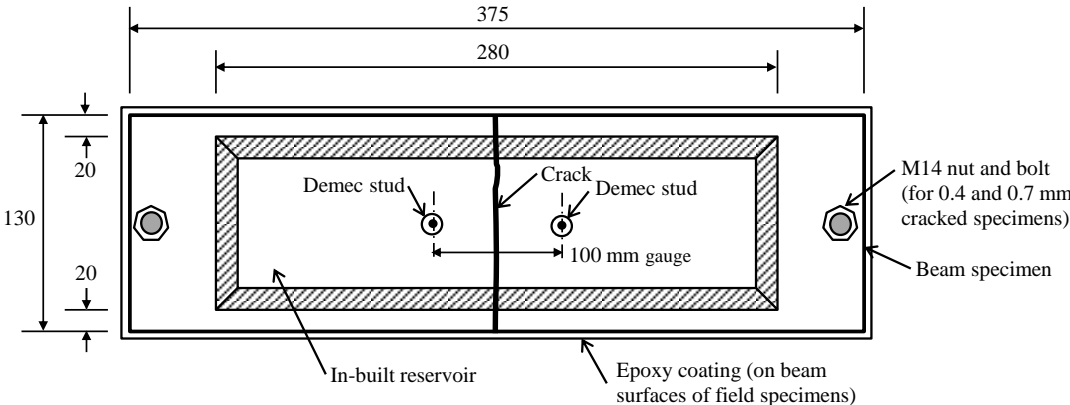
Location of demec studs for monitoring crack width in cracked specimens
